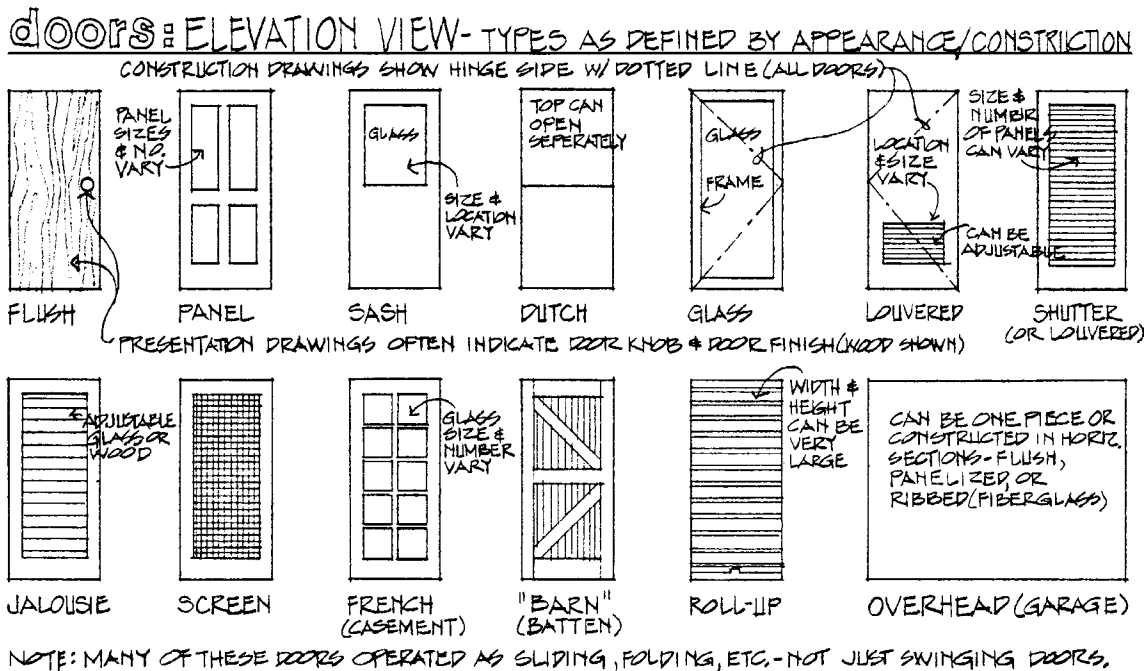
Door styles as drawn in elevation views. Styles are defined as to their appearance and construction features.
